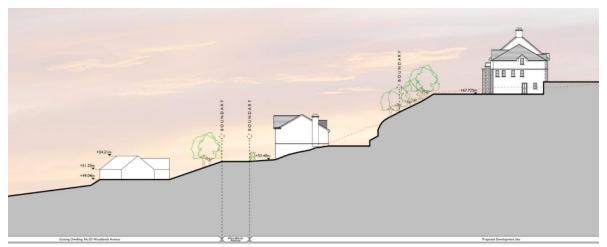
Proposed Section BB (Relationship with 3 Woodlands Avenue)
